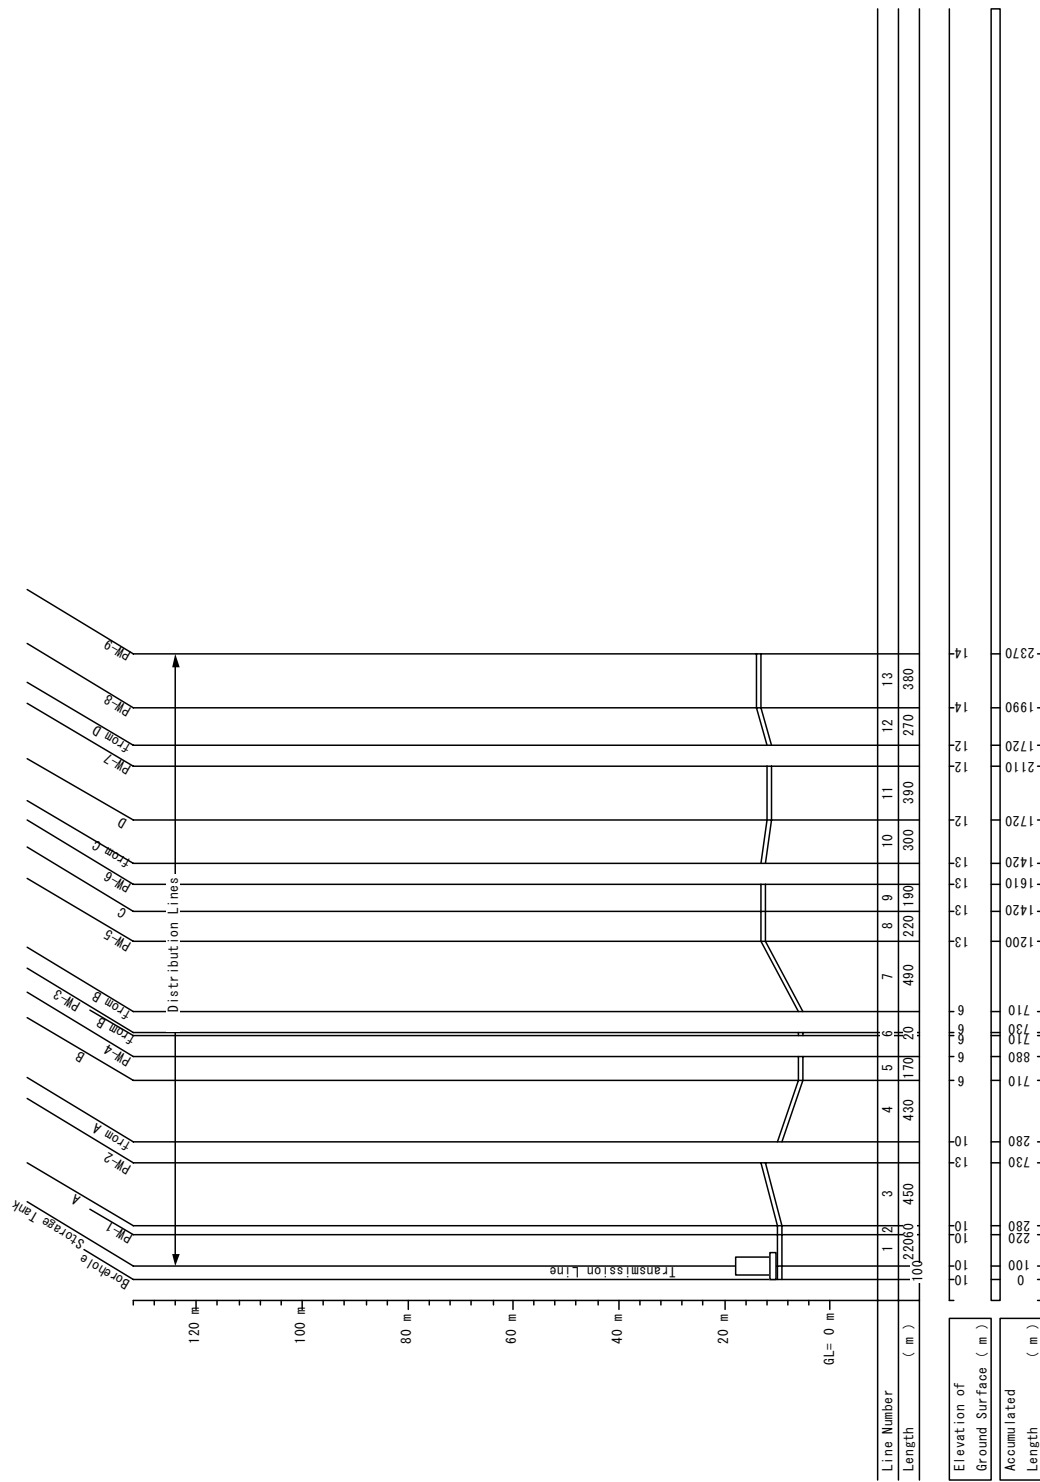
LONGITUDINAL SECTION (TUNDWI: 20/22(2))
